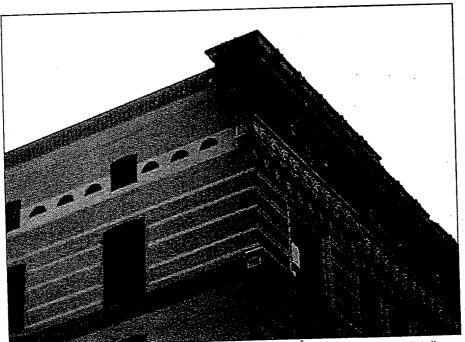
Banco Popular Building, 354 S. Spring Street, Los Angeles, detail view north showing tromp l'oeil (trick of the eye) stencil painting on secondary elevation (left) continuing ornament from primary façade (right)
